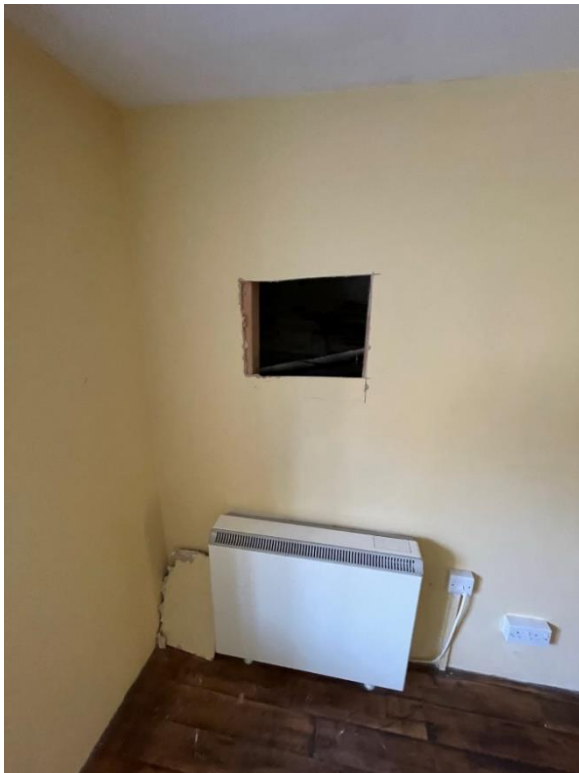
Existing Bedroom 5 to be converted into a ‘Jack and Jill’ bathroom, retaining the through-passage layout. Pipework to be boxed in at low level and soil pipes to be located within existing cupboard, dropping down into the utility below.
